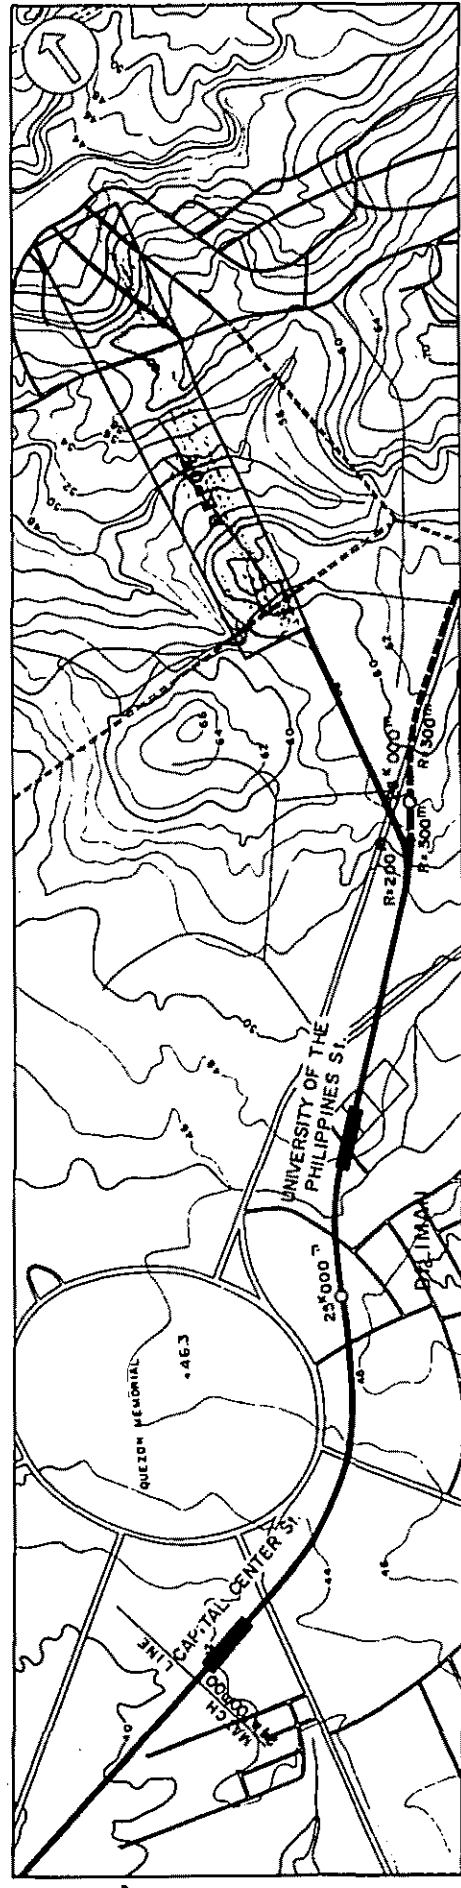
Plan and Profile of Recommended Alternative (8)
